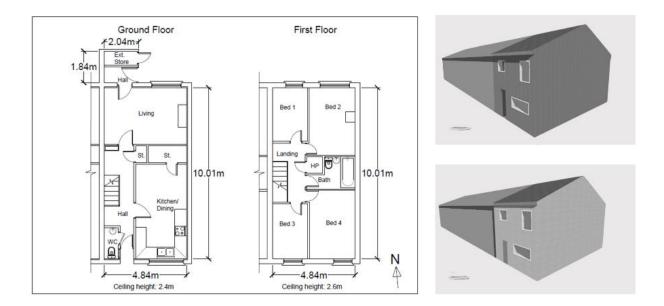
Floor plans and visualisation of Dwelling B before and after retrofit.
